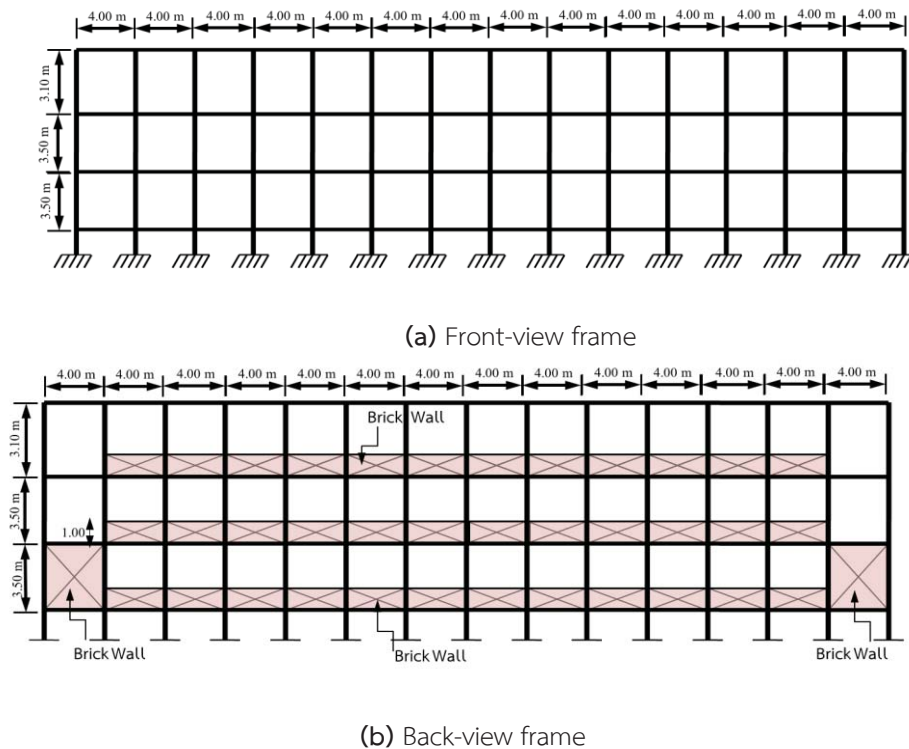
Existing building structural model: (a) Front-view frame, (b) Back-view frame.
